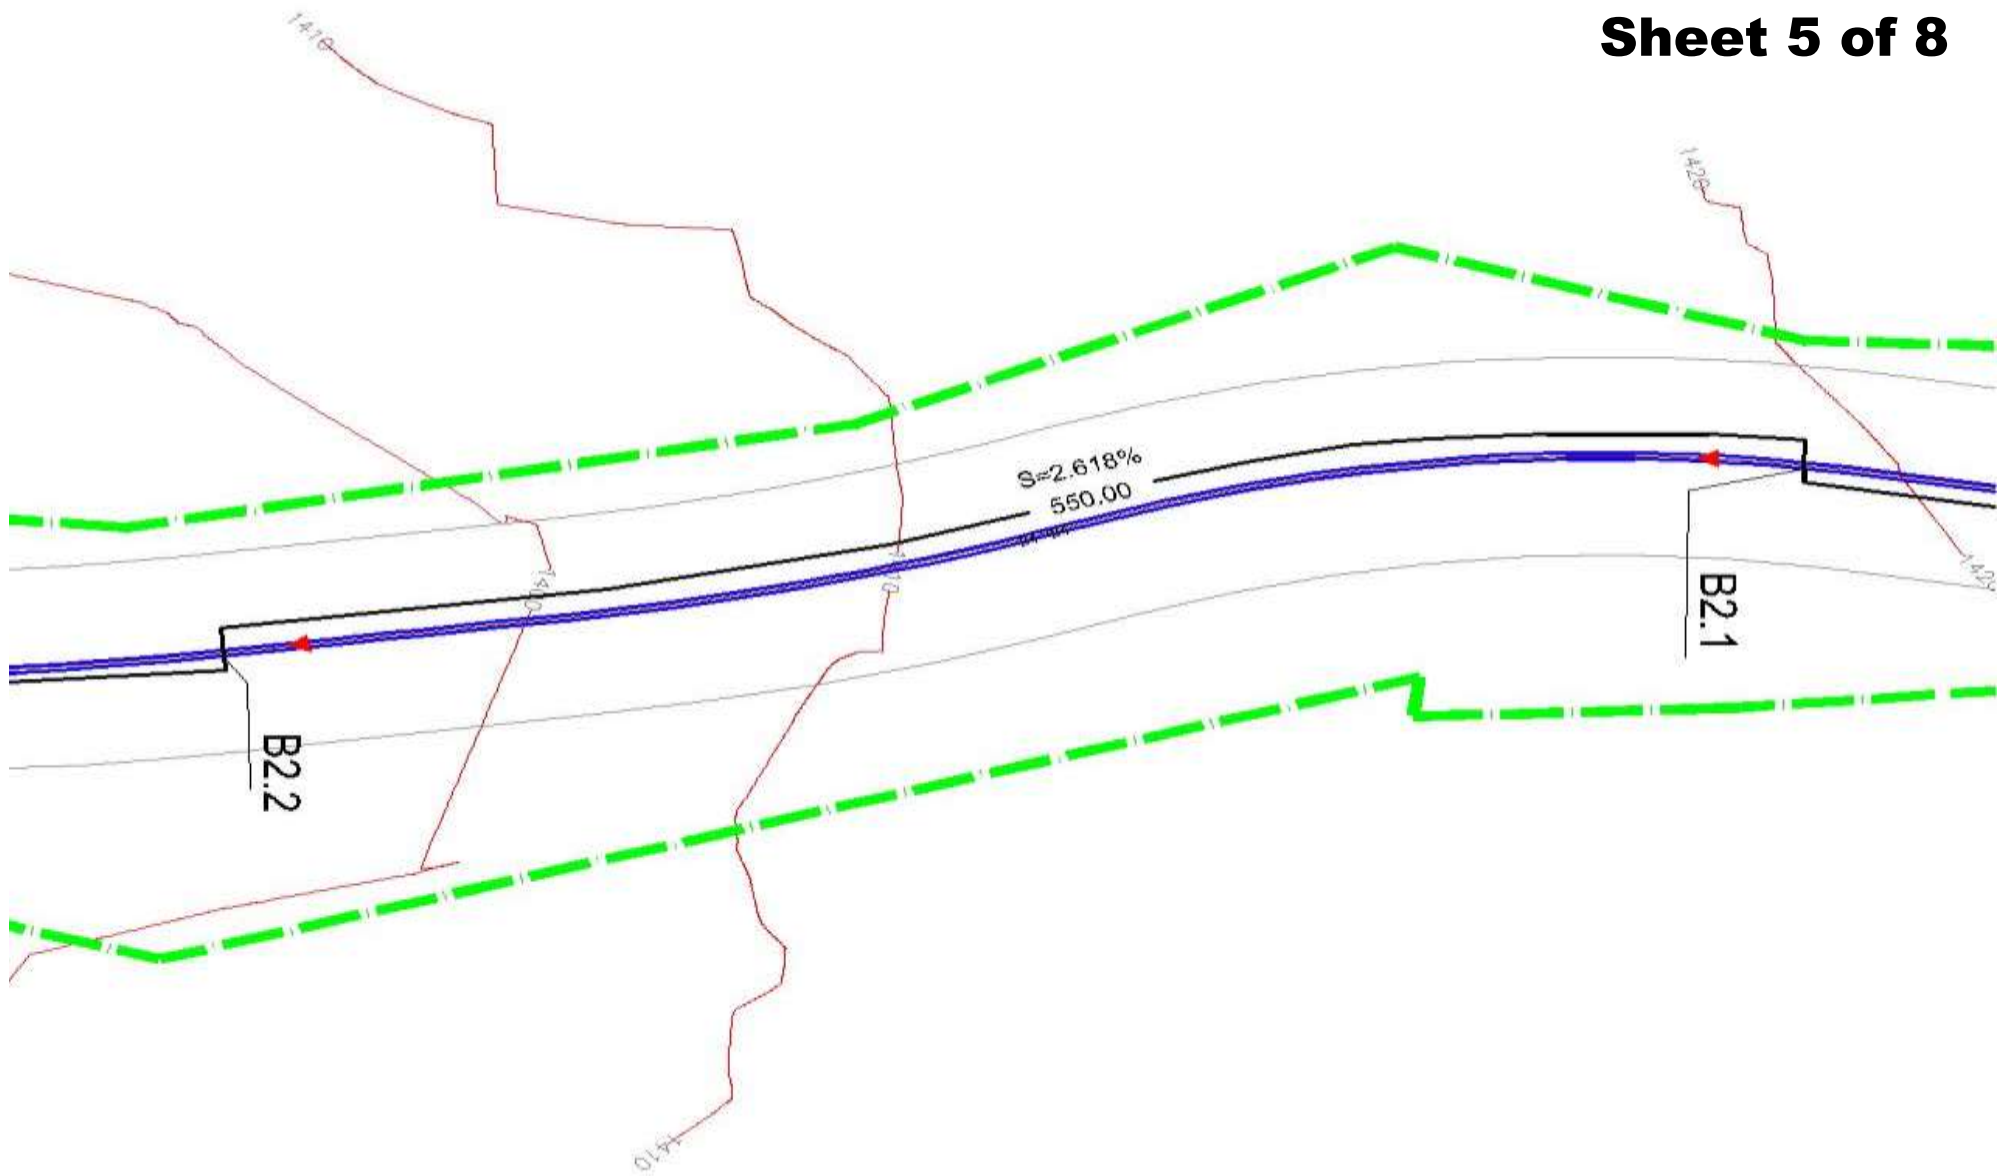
Storm drainage layout plan of Sub-catchment-1 part five(B2.1 to B2.2)
